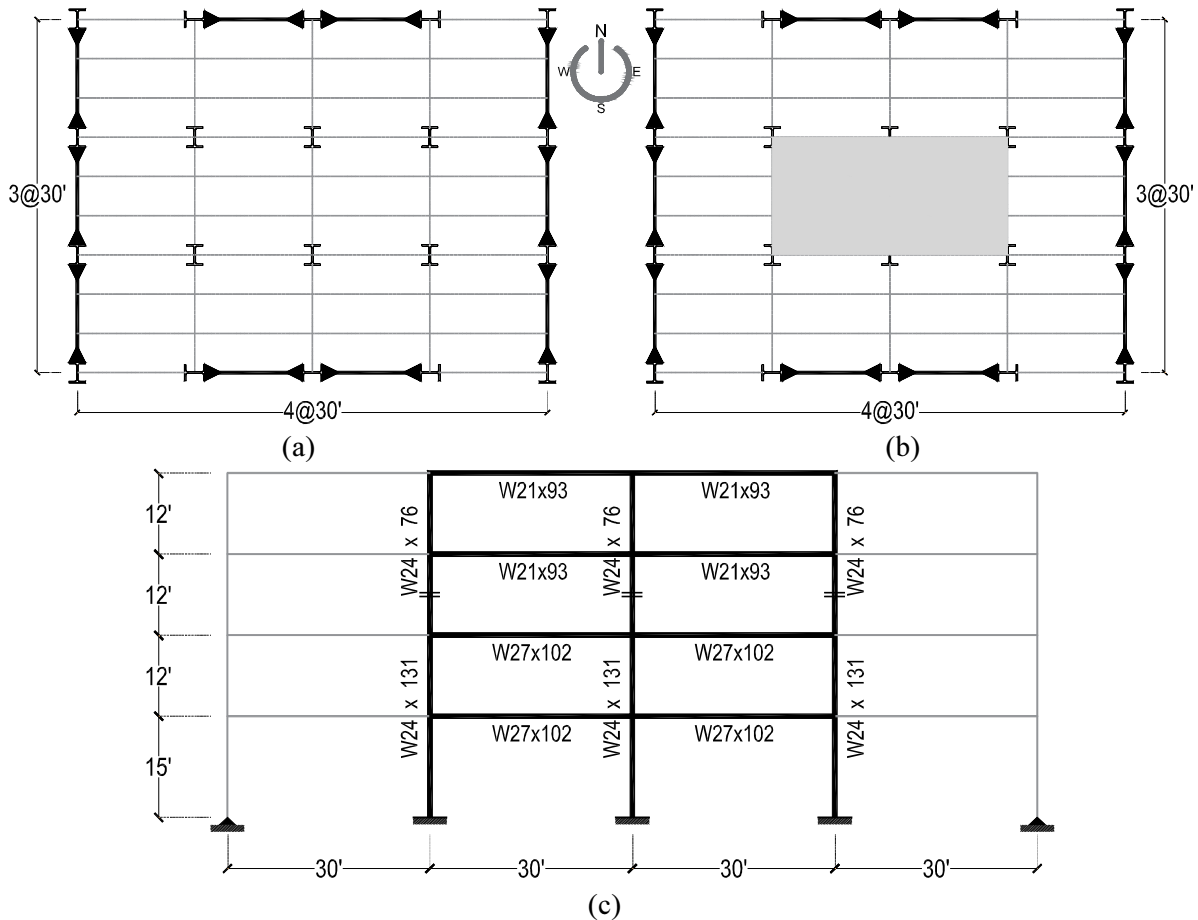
Prototype office building, (a) Plan view of a typical story, (b) Plan view of roof, penthouse highlighted in gray, (c) Elevation of EW SMRF (Lignos, 2008).
